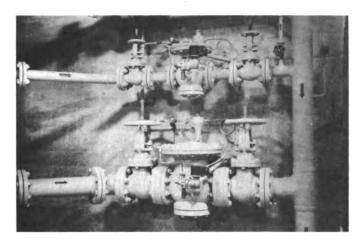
4- and 2-inch draft tube evacuation air valves—Chatuge.
